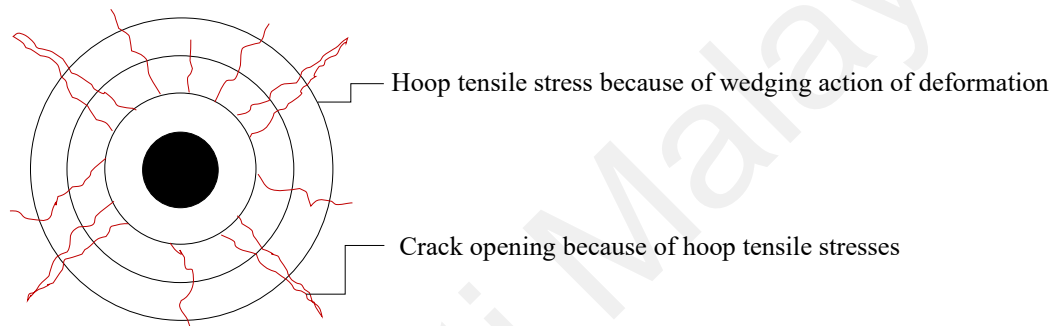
Crack opening, hoop stress surrounding a reinforcement in tension
